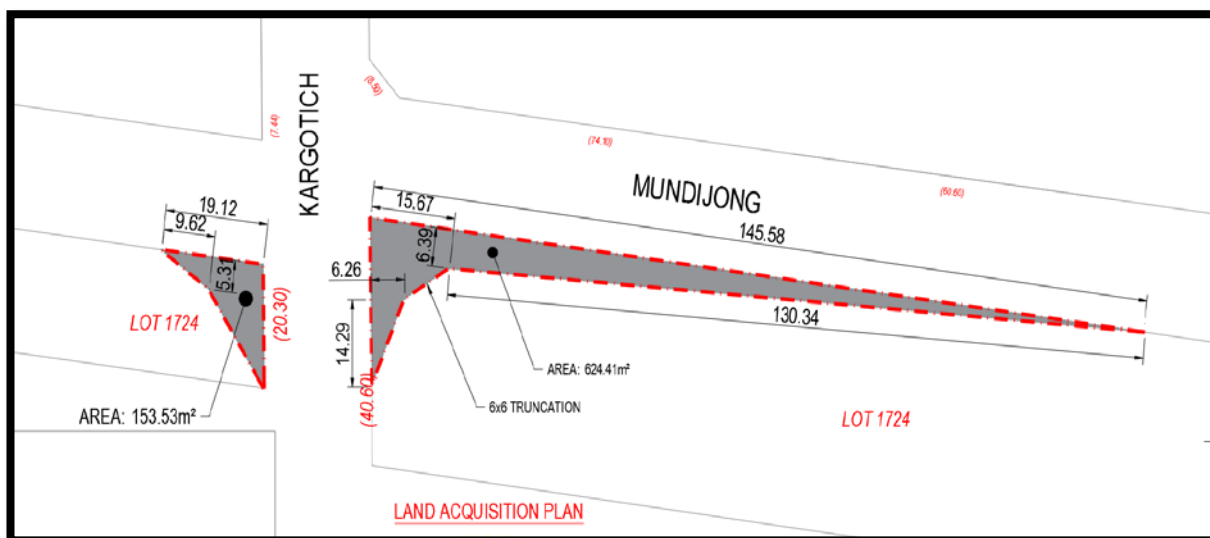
Layout plan of portion of land required for the construction of a roundabout at the intersection of Mundijong and Kargotich Roads
